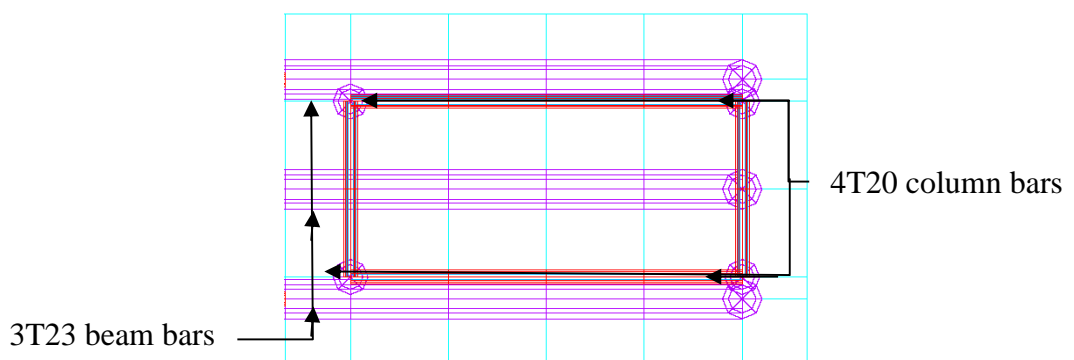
Column section at T-NSC1 & T-HSC1 (no CVB) just above the beam bar showing 4T20 column reinforcements and 3 T23 beam bars in horizontal view. The beam is anchored to BCJ.
